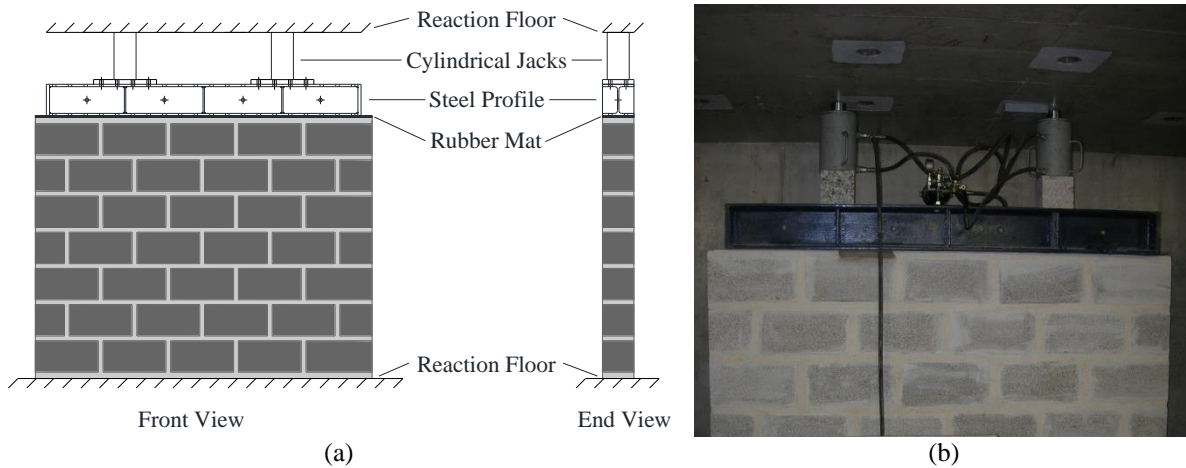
Loading of masonry walls: (a) Schematic layout; and (b) Photo of loading the regular wall
